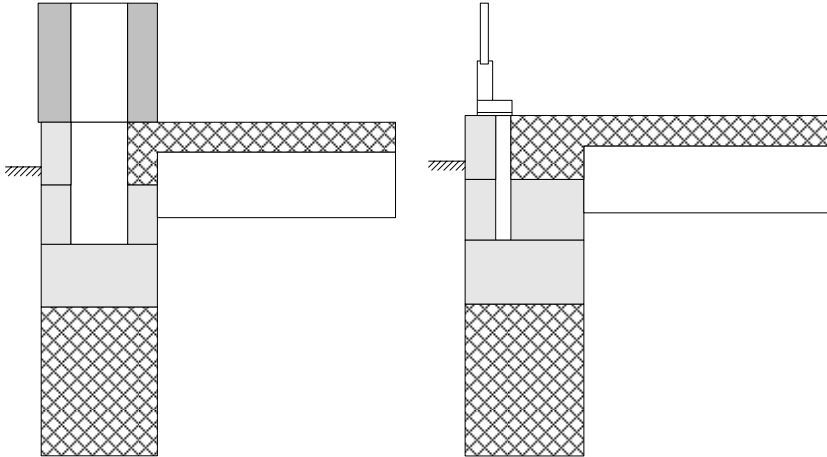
Sections of a joint between the outer wall/foundation/slab-on-ground respectively door/foundation/slab-on-ground
